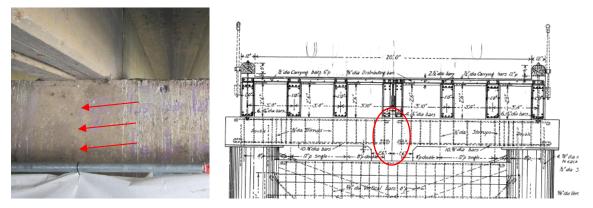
The joint in Pier 1 headstock directly under Girders 4A & 4B (Left) and in the drawing (Right)
